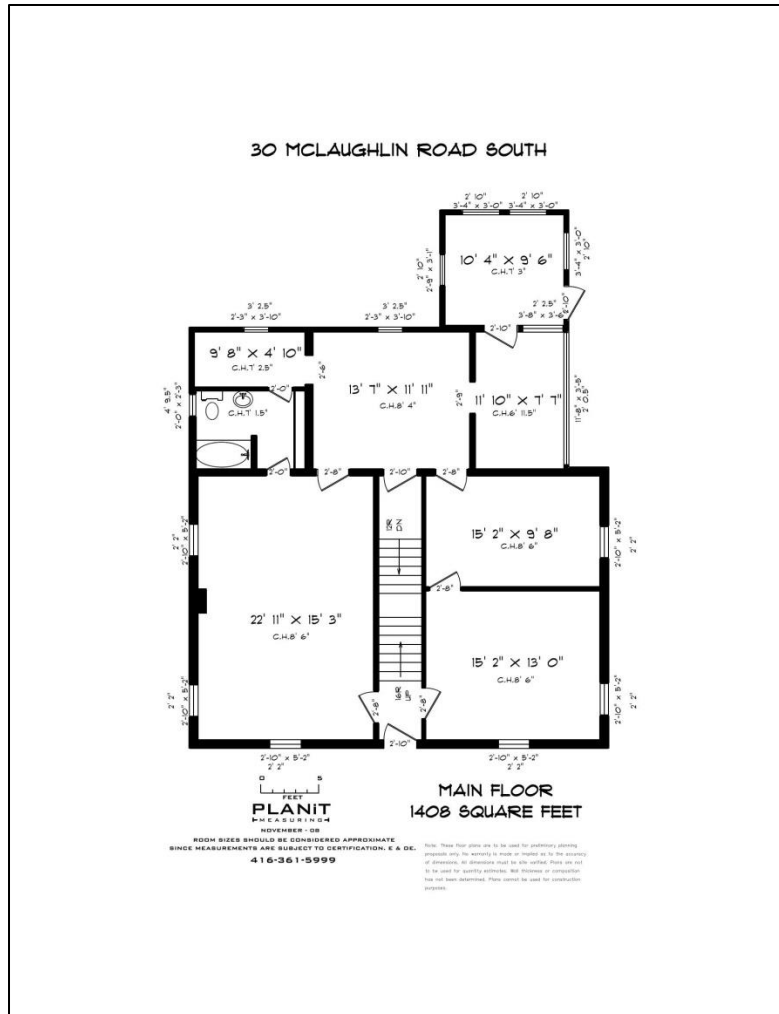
Planit As Found Elevations & Drawings, City of Brampton
